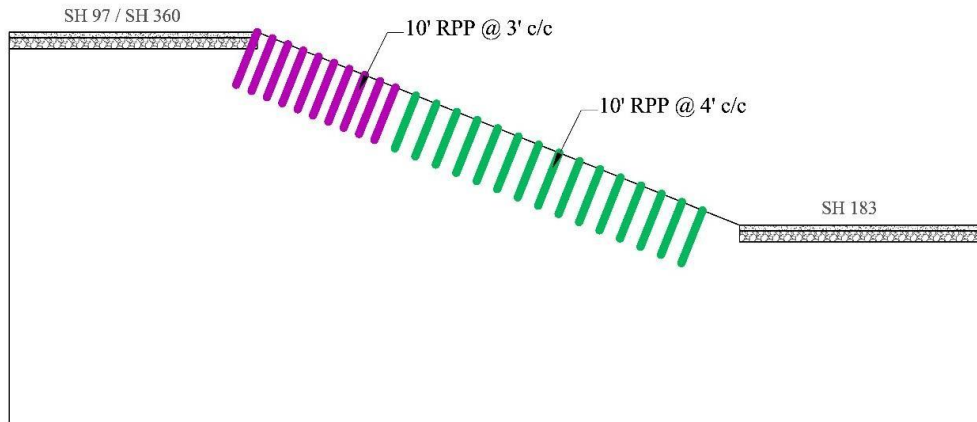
Section A-A of RPP layout at SH 183 Slope
